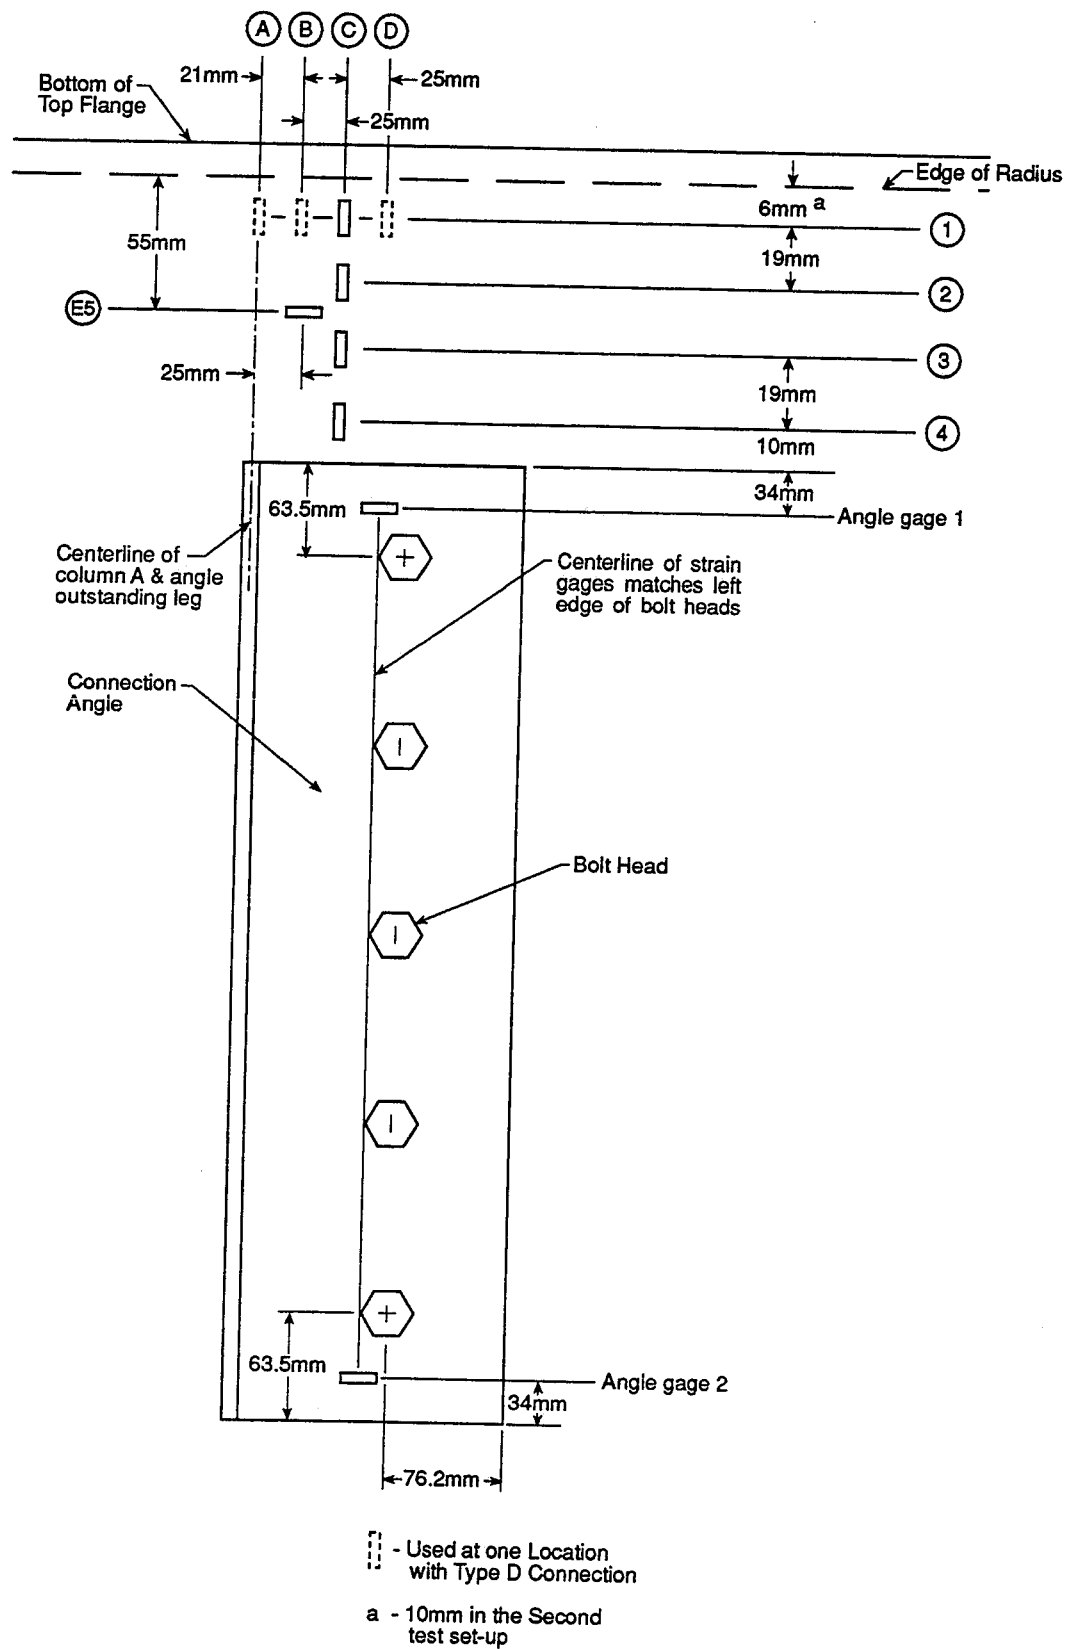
Gaging Patter for Type D and Type D* Connections on Inside Girders
